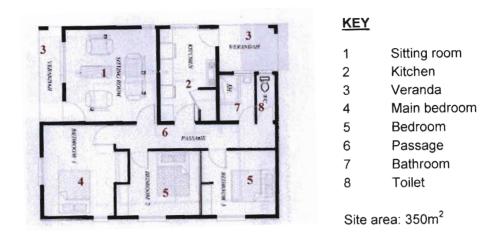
NHA floor plan with mono-purpose rooms (source: NHA 2004)
